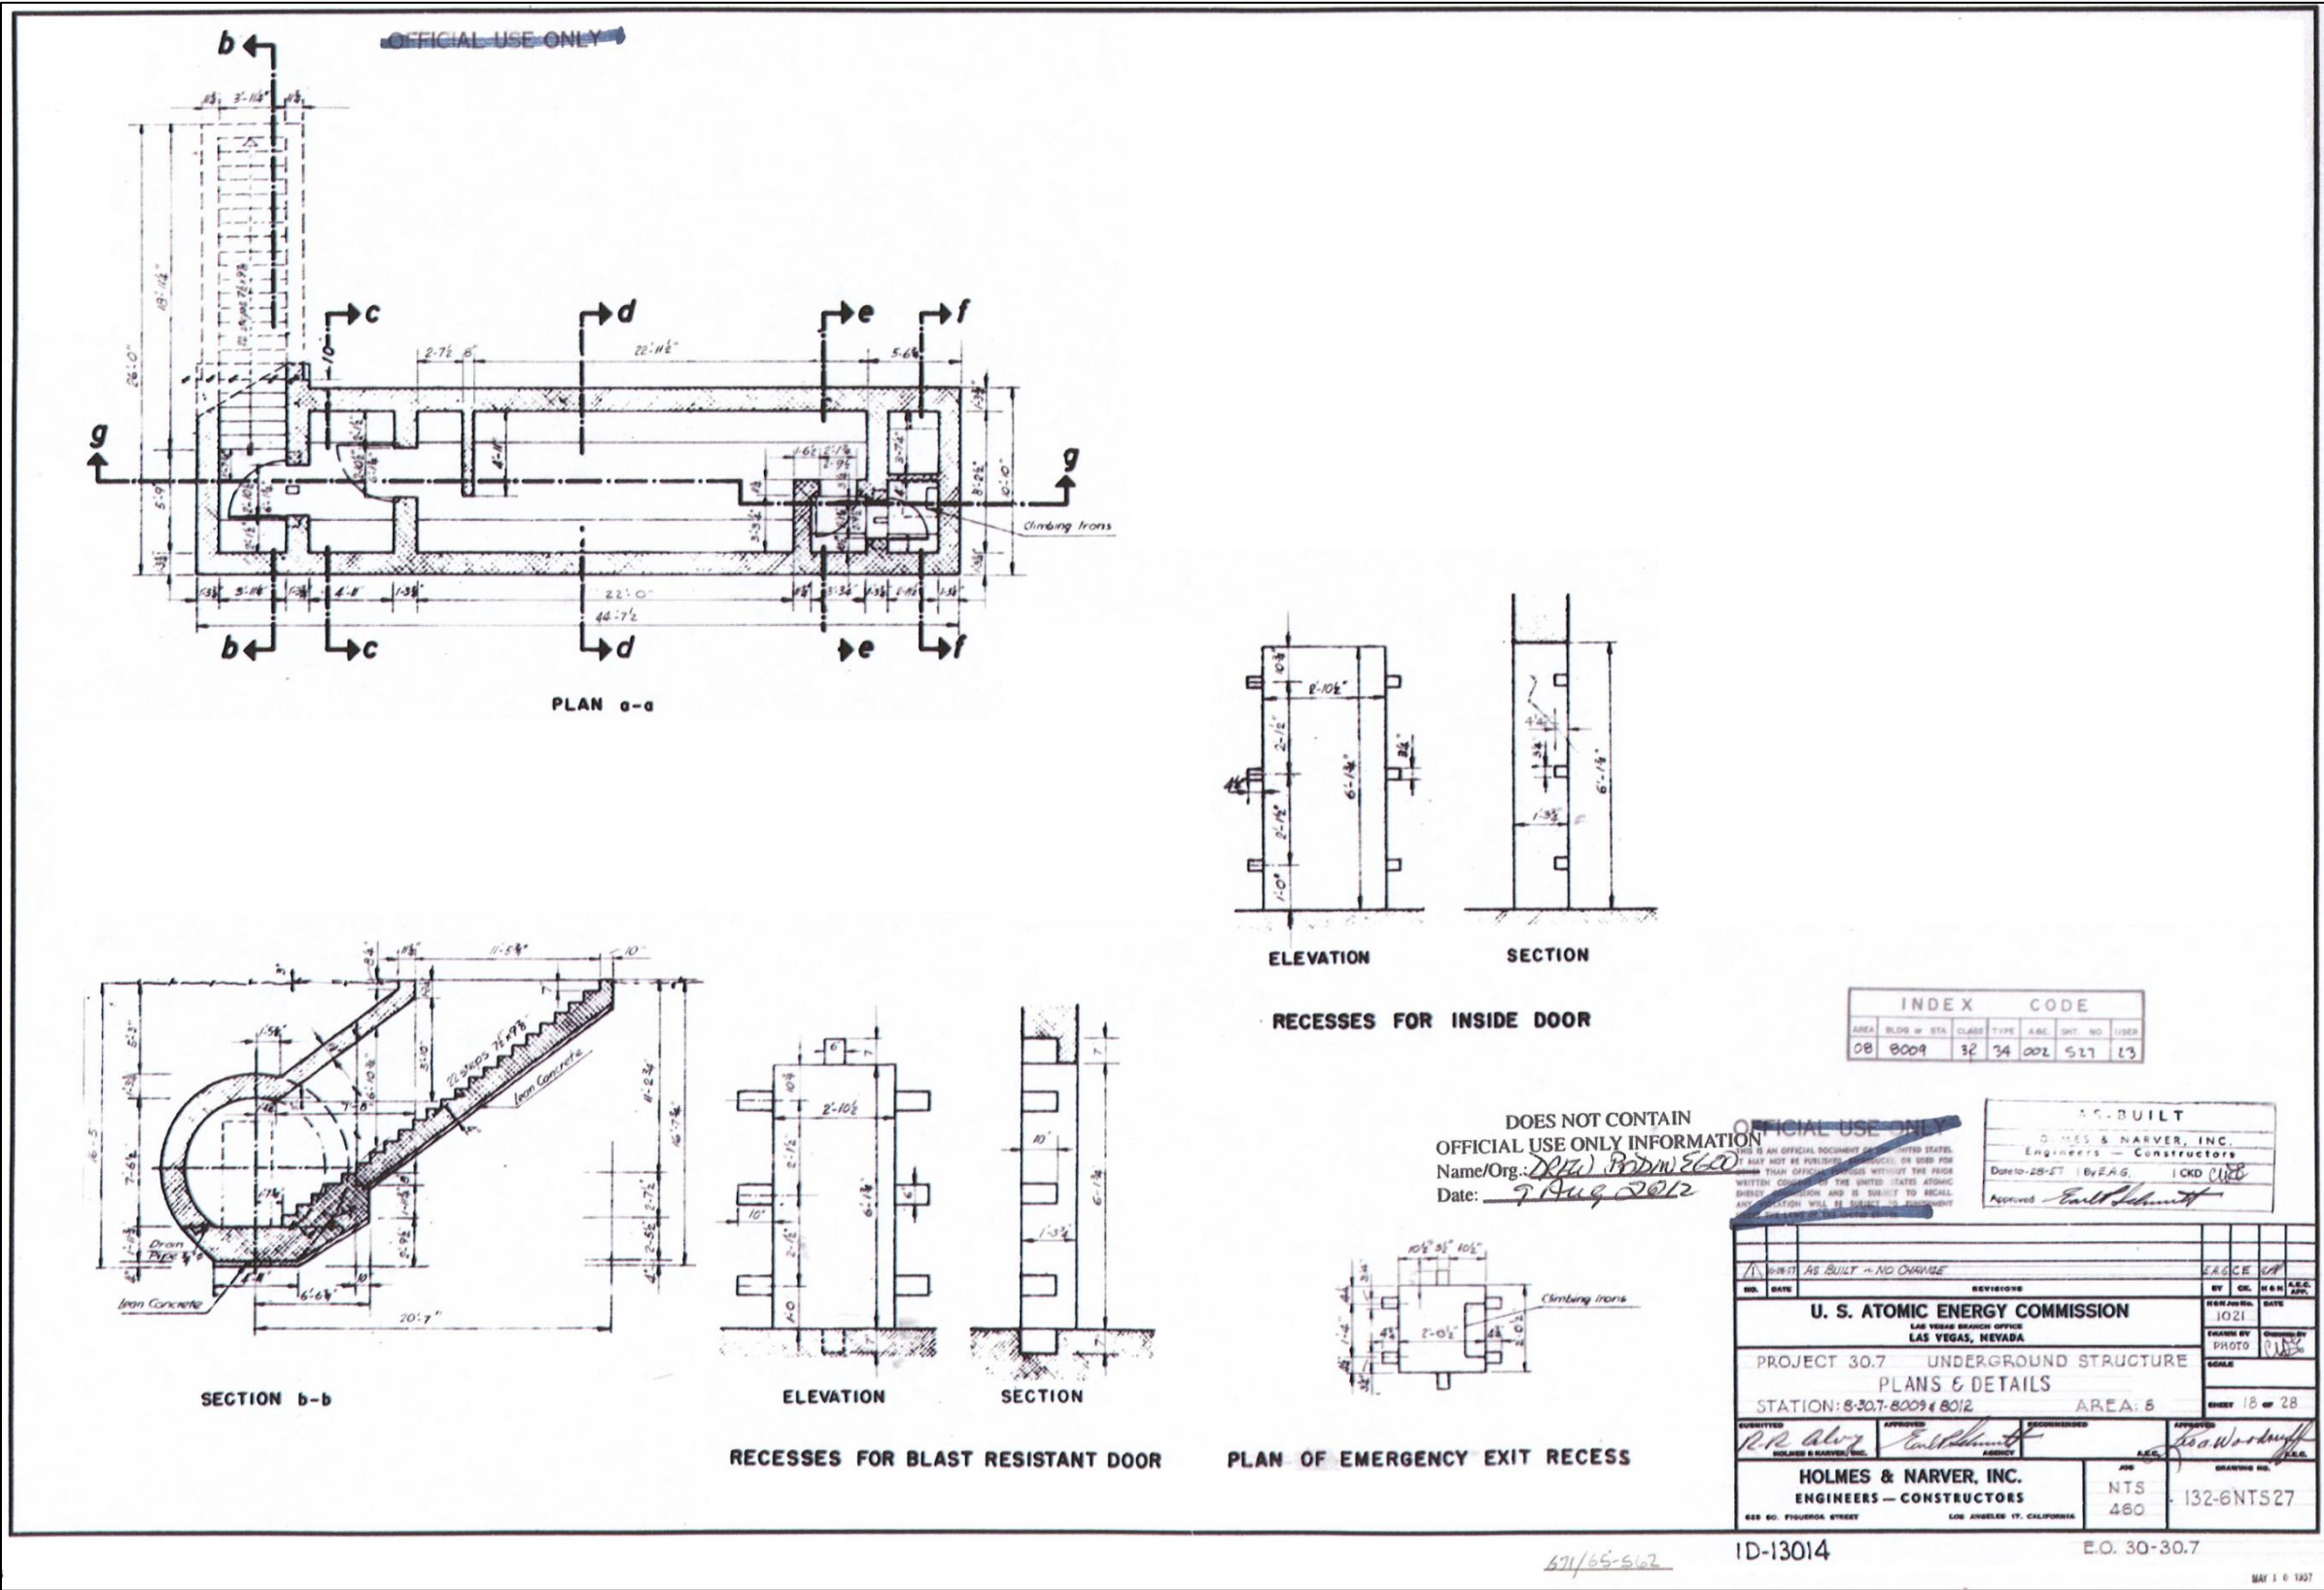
S913 and S915, German underground personnel shelters CAa and CAb, plans and details.
